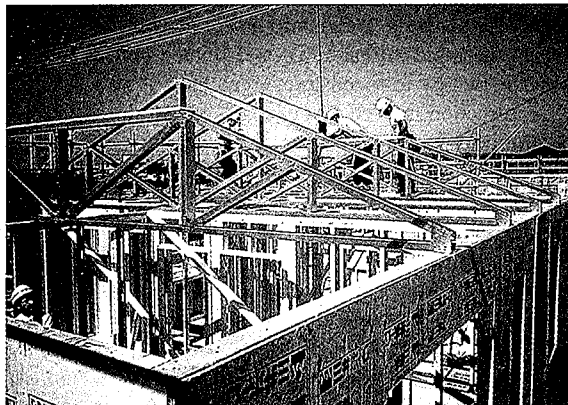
Hybrid construction (jointly developed with Mitsui Home) in wooden two-by-four house
